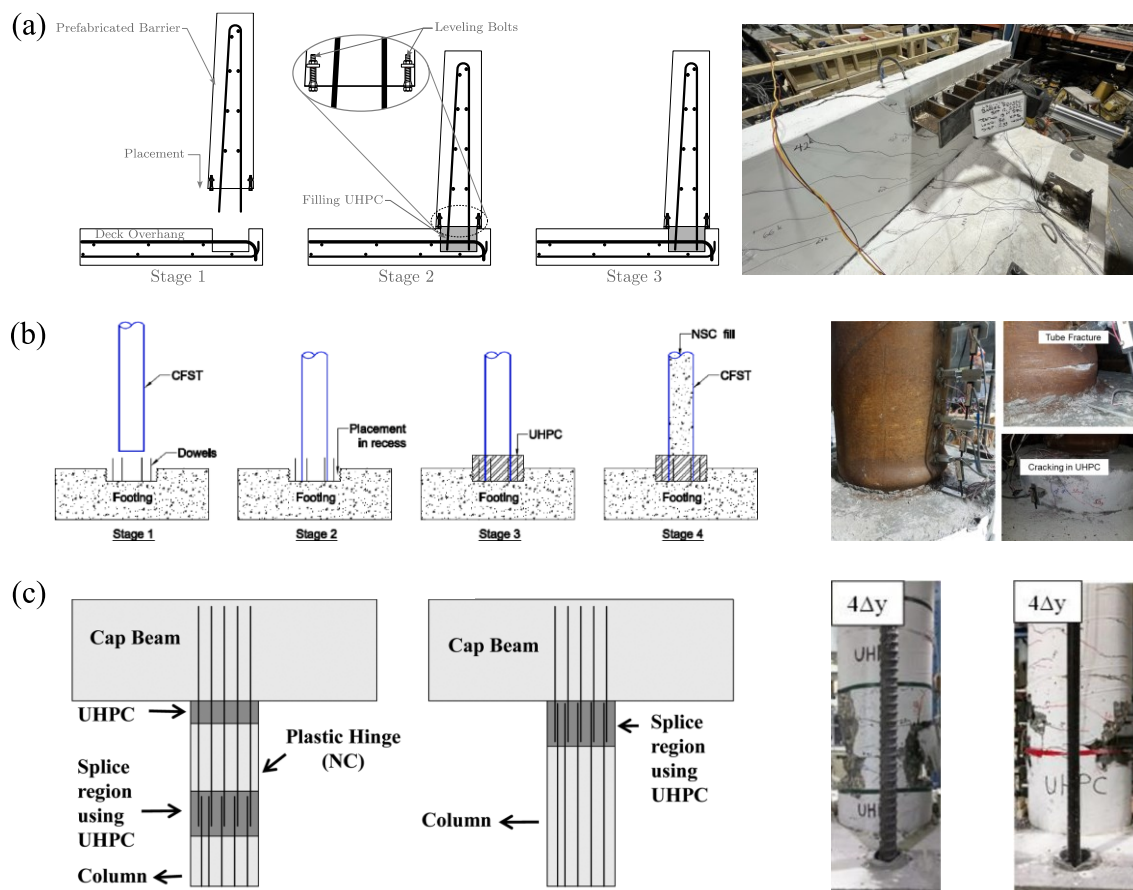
Developed UHPC based connections: (a) Barrier-to-deck connection, (b) concrete filled steel tubes to footing connection, and (c) Column to cap beam connections.
